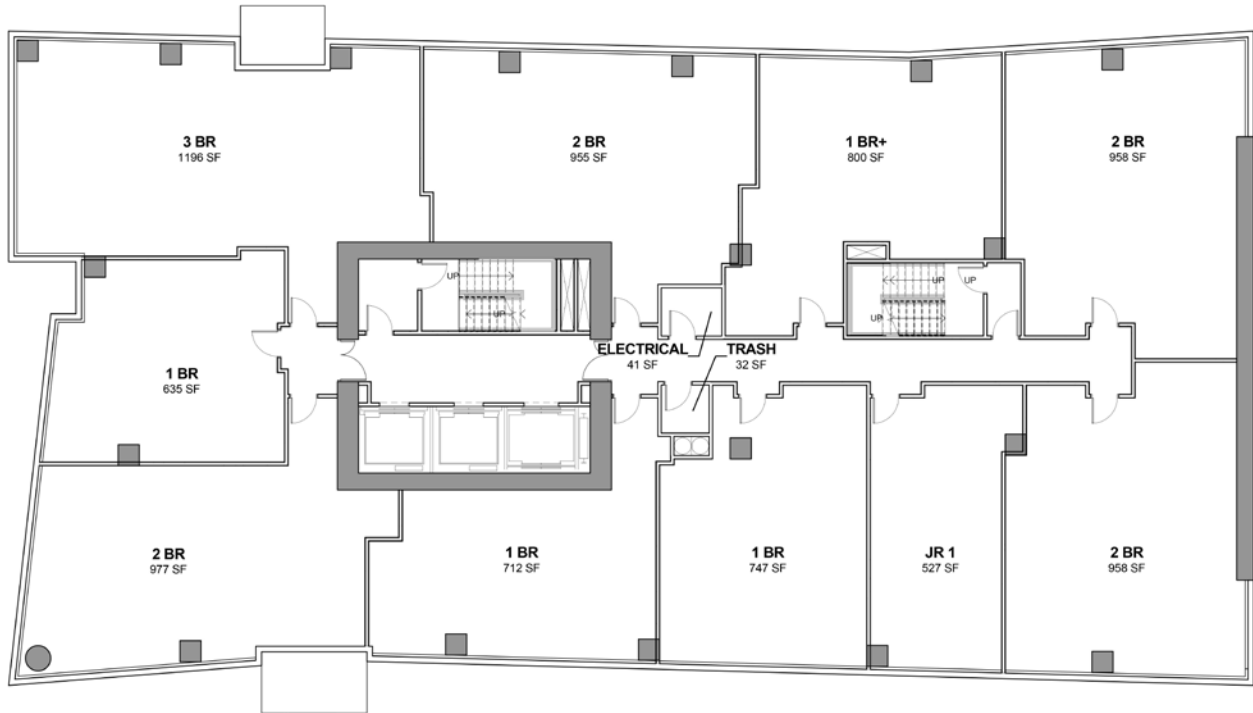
Typical Residential Floor Plan (Floors 23-32)
